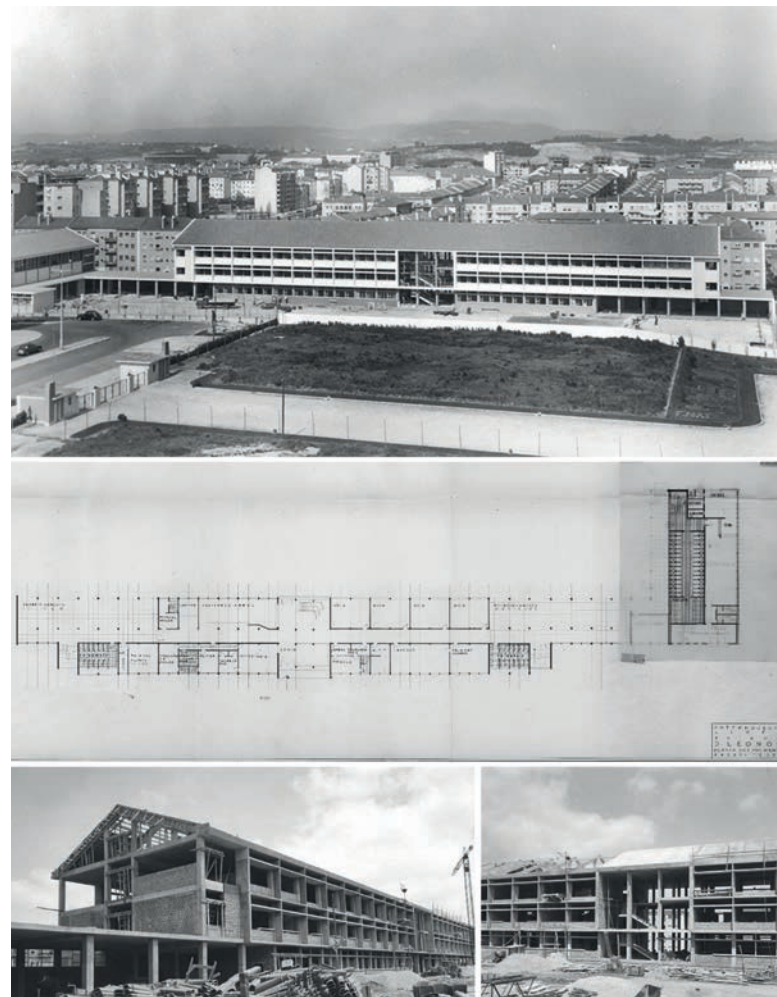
RDLSS, Lisbon, Portugal. Original school building, 1961. Ground floor plan, 1956. During construction, 1960-1961.
